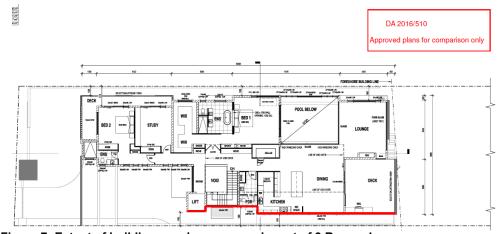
Extent of building envelope encroachment of 3 Rayner Lane
